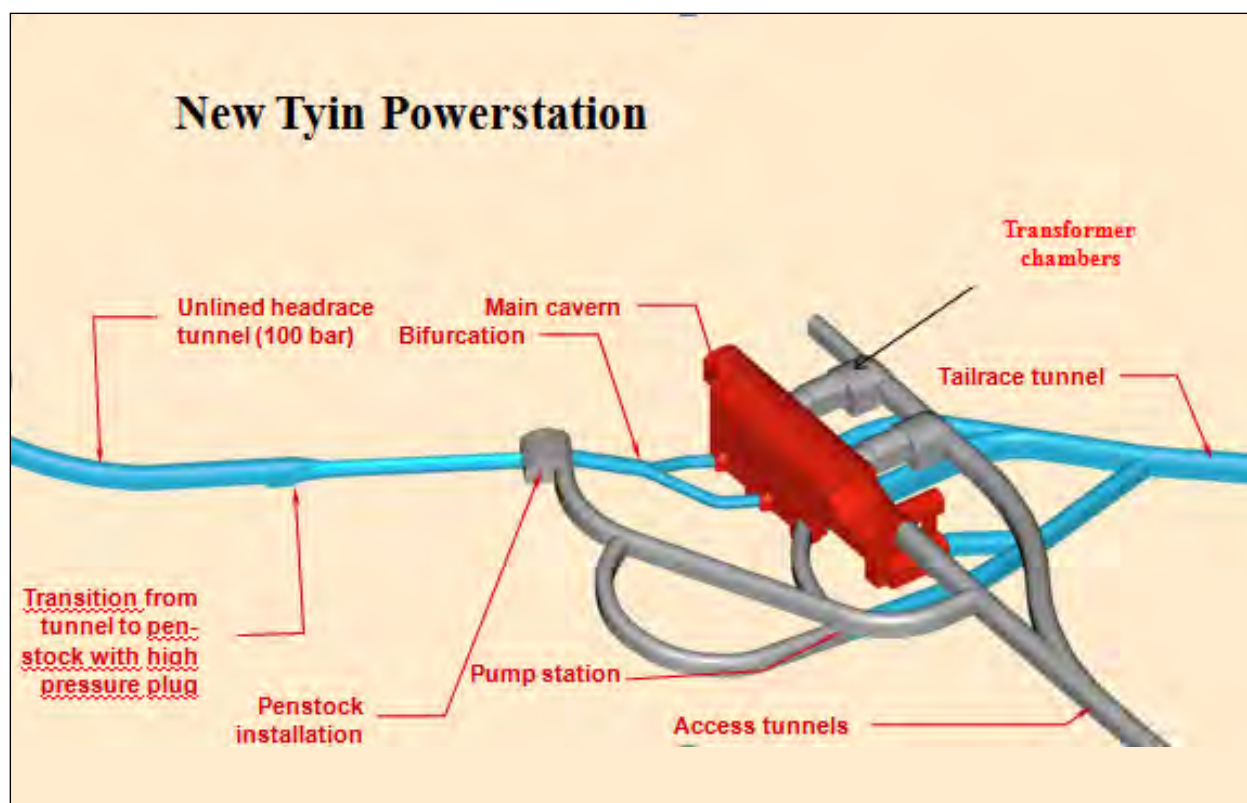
The new powerstation. Penstock installation: area with special section for pipe access and control.
